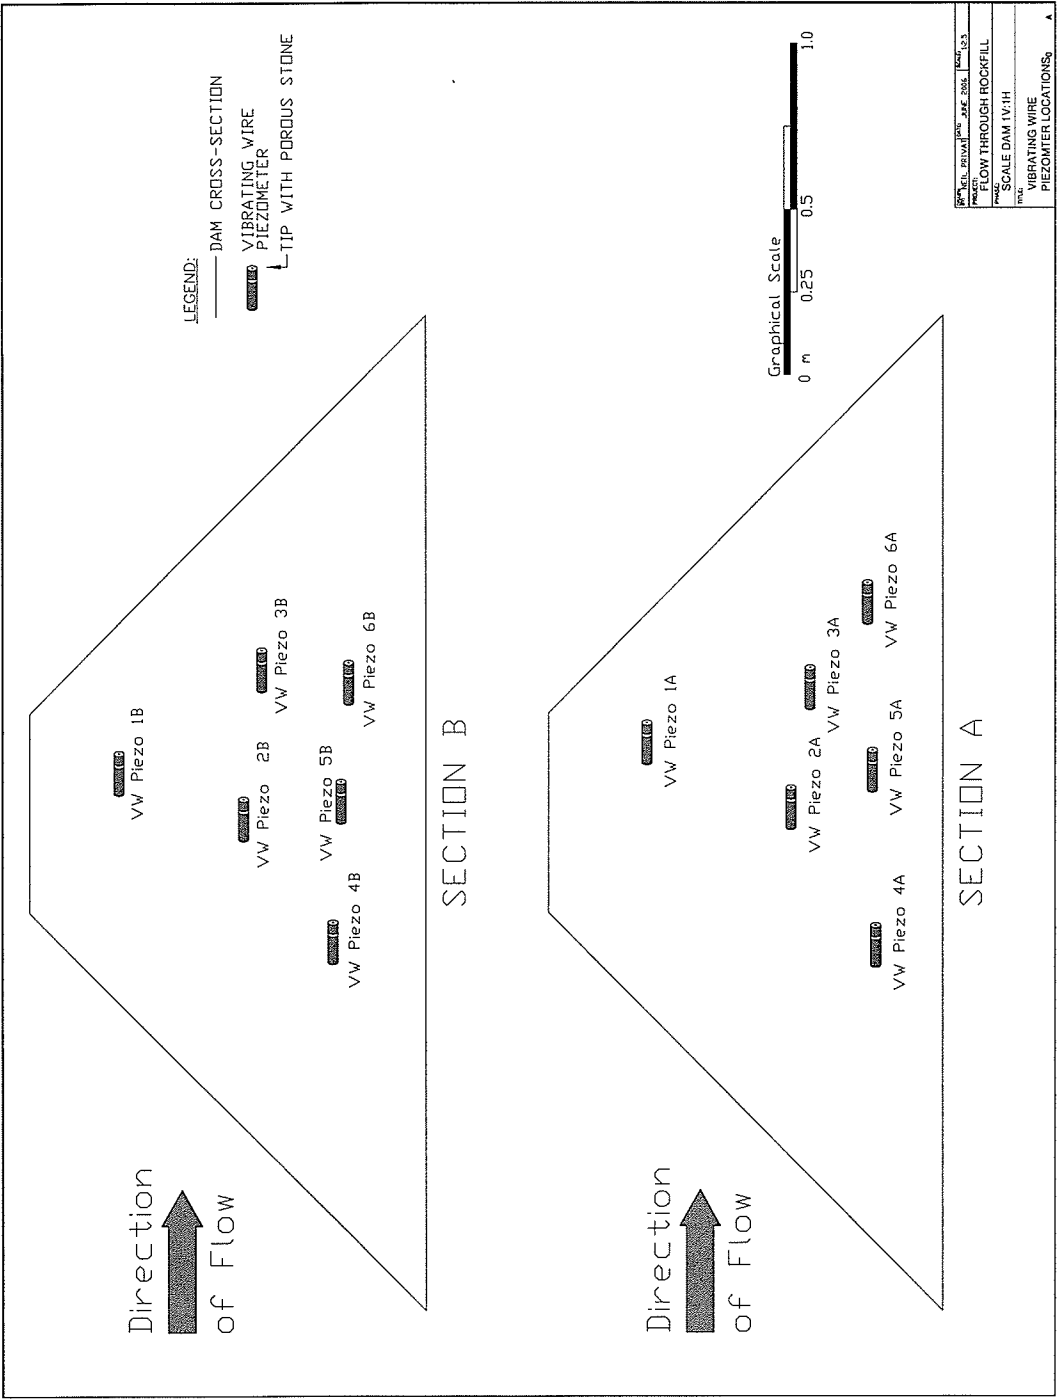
Scale Dam 1V:1H, Cross-sections with Locations of Vibrating Wire Piezometers
